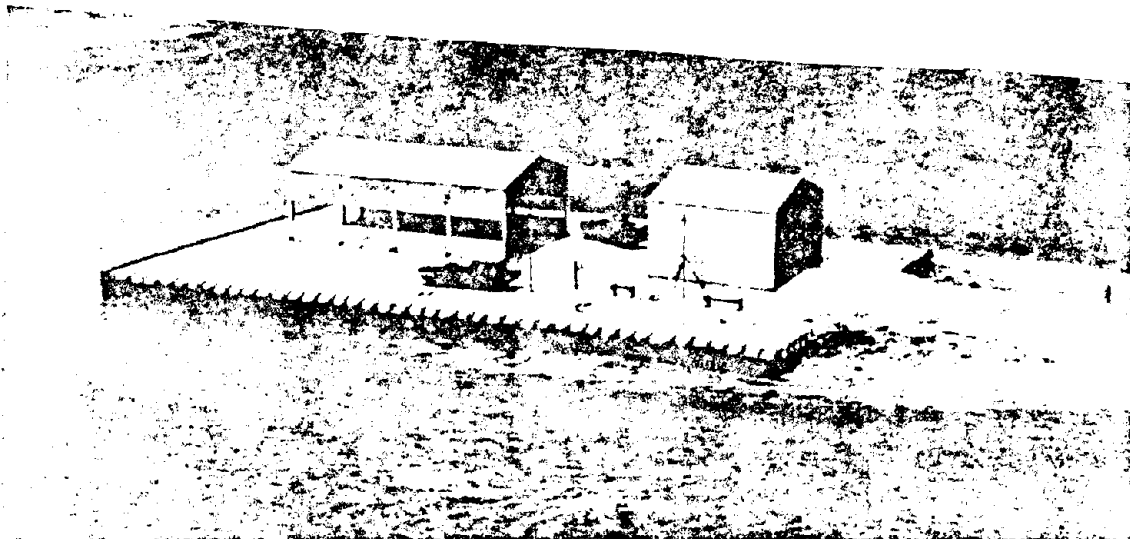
Air view of structures on manmade Island 2, before Cherokee (looking toward Site Dog).
